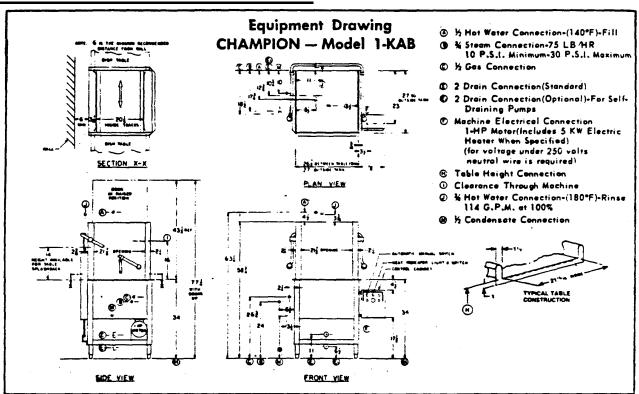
Equipment Drawing 色 为Hot Water Connection-(140°F)-Fill ③ ¾ Steam Connection-75 LB HR CHAMPION - Model 1-KACB 10 P.S.I. Minimum-30 P.S.I. Maximum © 2 Drain Connection(Standard) 2 Drain Connection(Optional)-For Self-Draining Pumps Machine Electrical Connection 1-HP Motor(Includes 5 KW Electric Heater When Specified) (for voltage under 250 volts neutral wire is required) @ Table Height Connection SECTION X-X © Clearance Through Machine @ 1/4 Hat Water Connection-(180°F)-Rinse 114 G.P.M. at 100% ½ Condensate Connection TYPICAL TABLE © SIDE VIEW FRONT VEW
